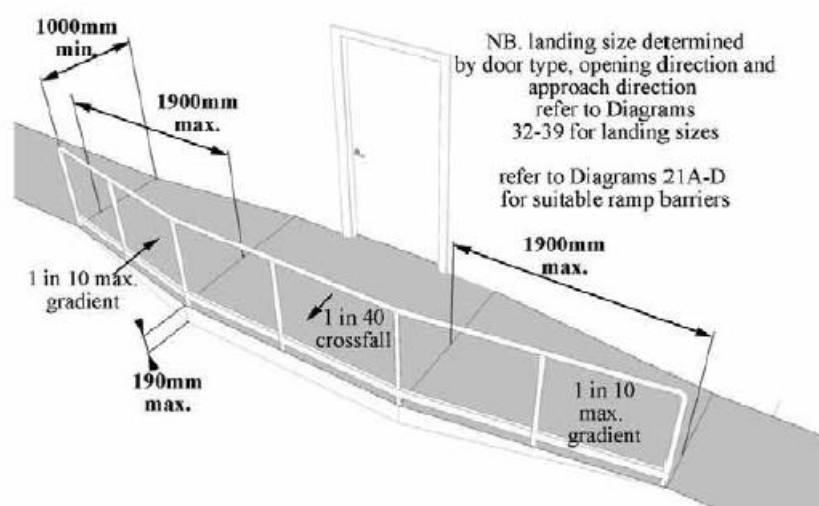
Step Ramp at External Doorway – Side Approach
